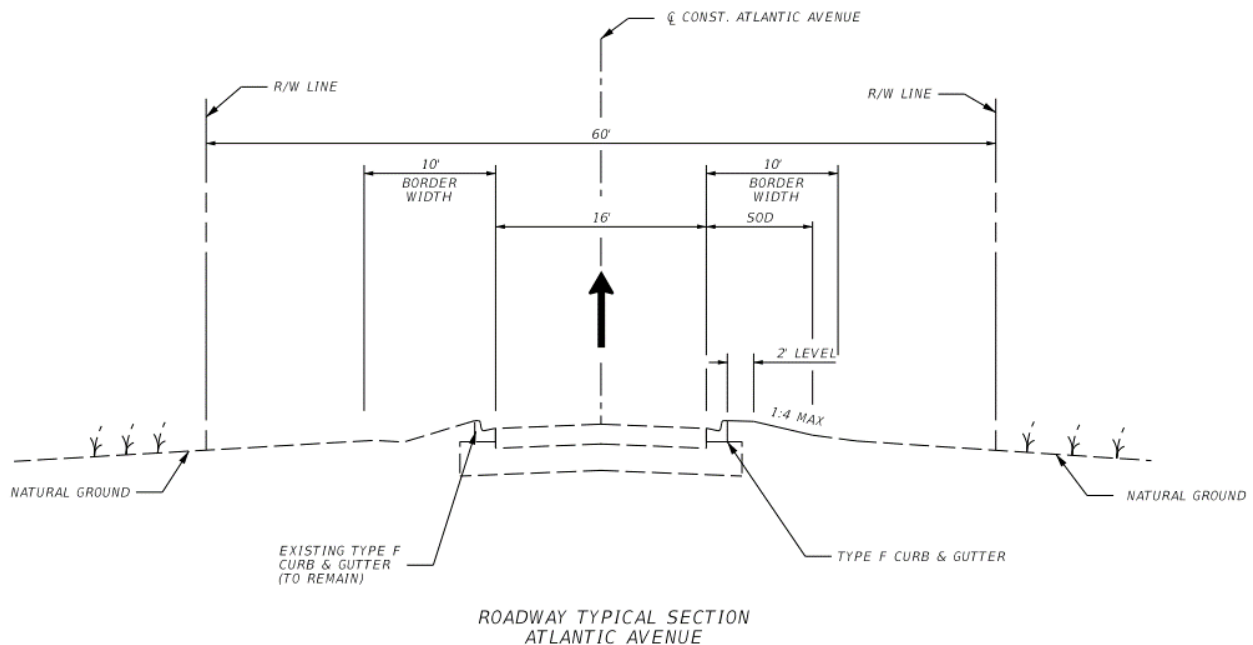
Existing Atlantic Avenue Roadway Typical Section
